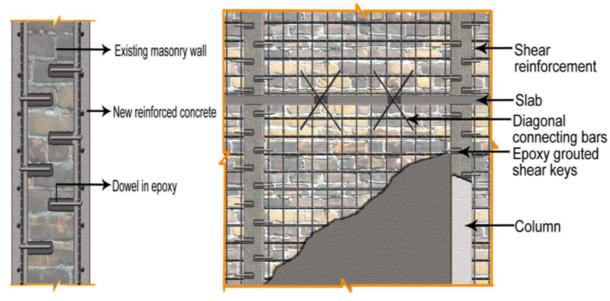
detail of retrofitting procedure for Stone wall (credit: TESRA ppt)
